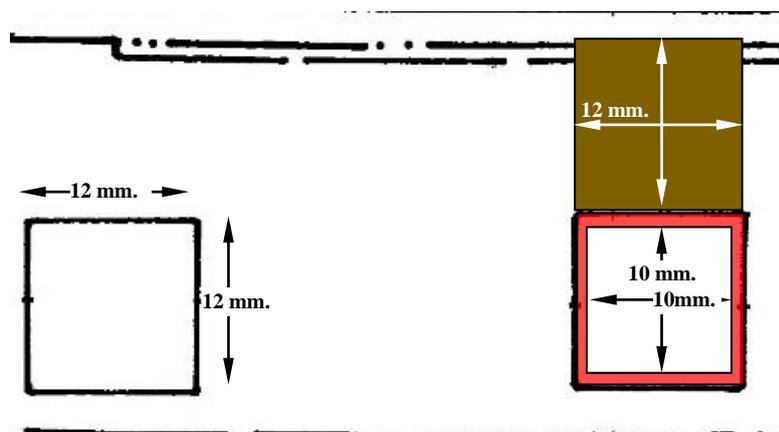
Plan Sheet 11 Gunport Openings (1 mm. battening)
